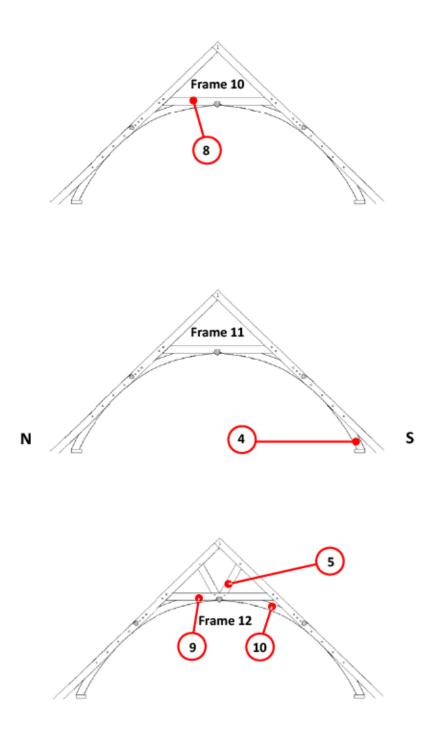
The chancel roof trusses to show sampled timbers (after Baart Harries Newall, Architects, Shrewsbury)
